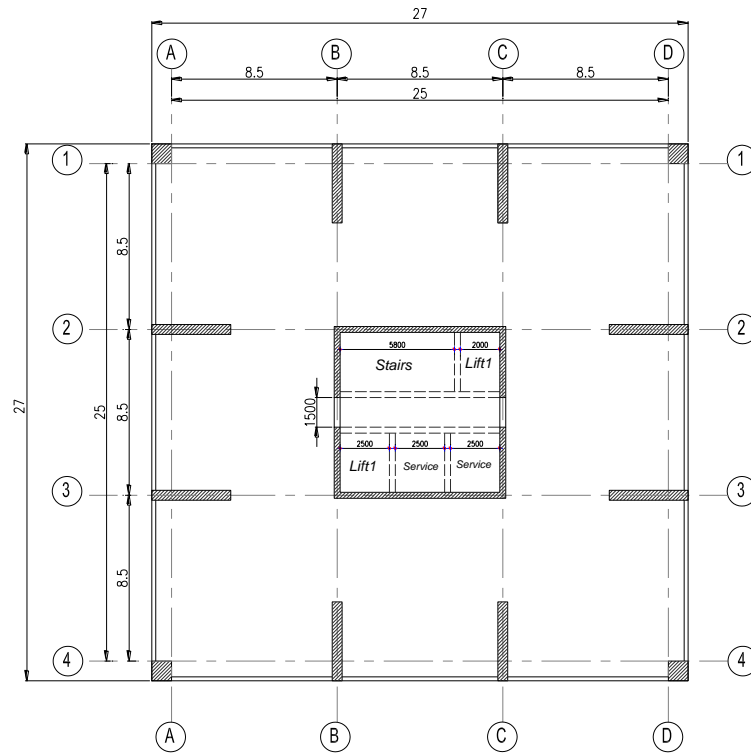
Layout of the 18 and 26-story building showing different structural members
